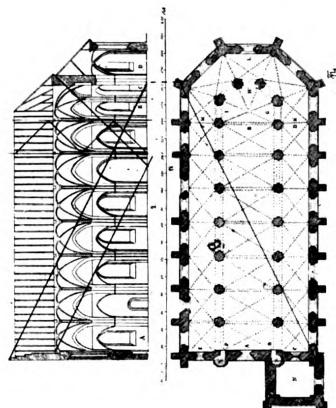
Church of Our Lady, Helsingborg. Plan and longitudinal section, analysis.
